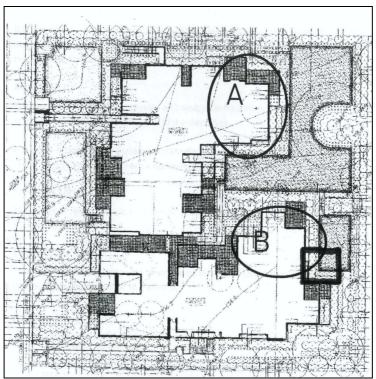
Original proposal - Areas of the building that overshadow other apartments. Floor area could be relocated to the area shown with the blue rectangle.
